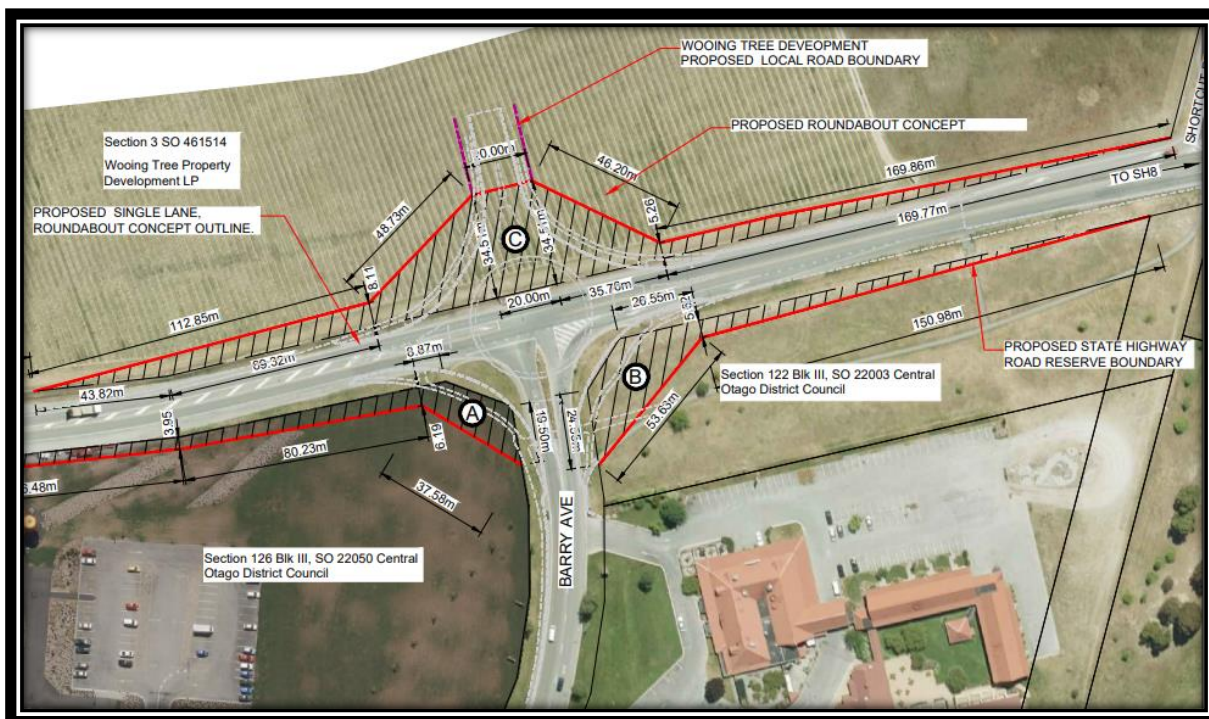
Preliminary Plan: Wooing Tree Roundabout
